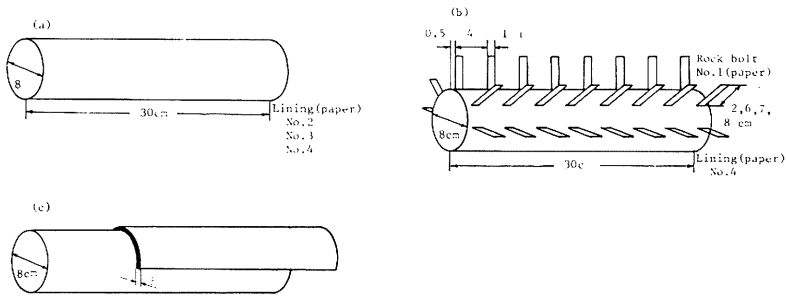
Size and arrangement of lining and rock bolt. (a) for Test A, (b) for Test C and (c) for Test B.
